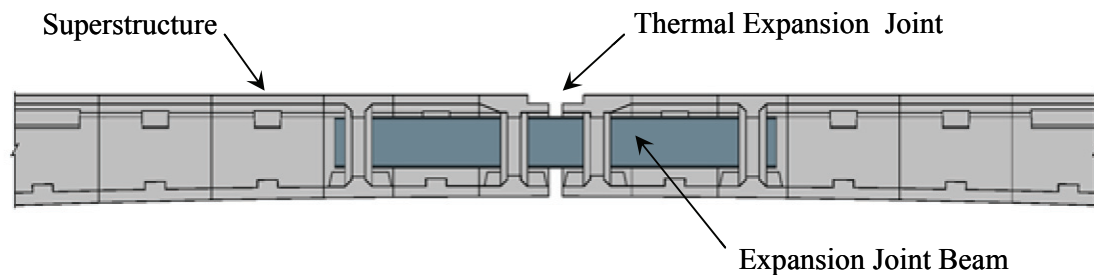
Superstructure Expansion Joint Beam (Courtesy of International Bridge Technologies)
